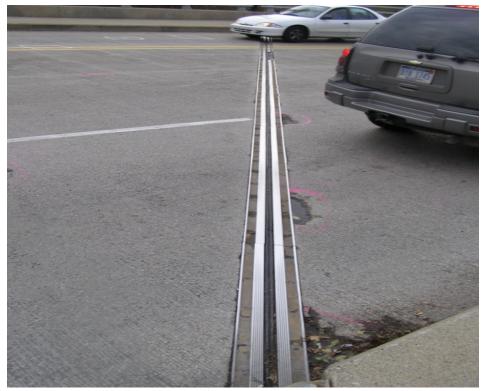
Spalling along South Expansion Joint (looking west)
